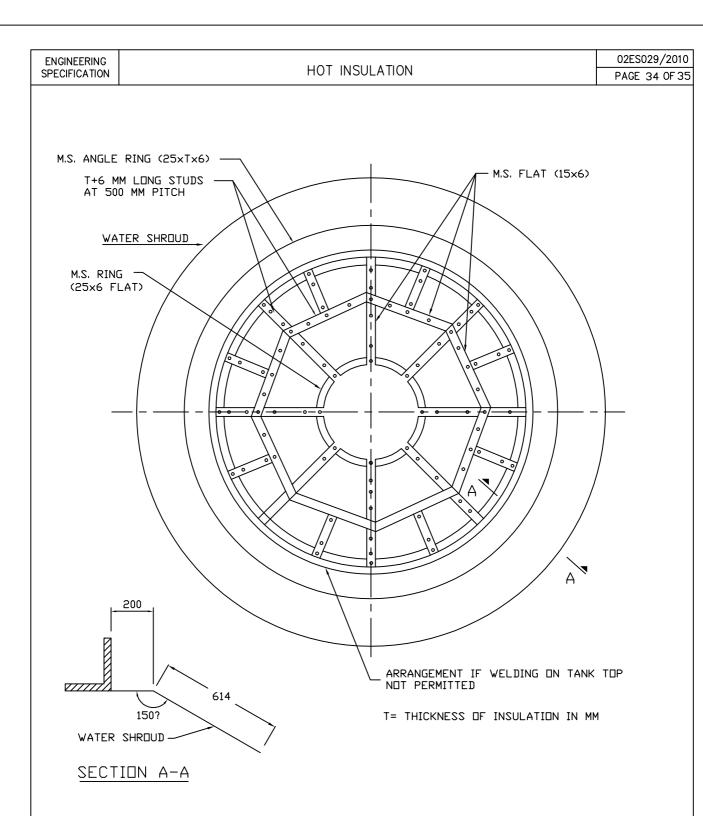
DETAILS OF TANK ROOF INSULATION SUPPORTS
